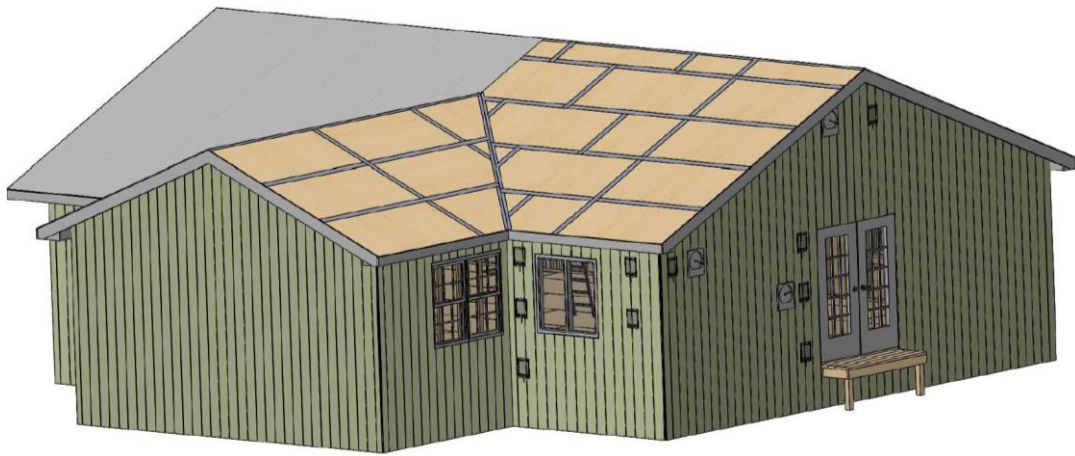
Conceptual drawing for full-scale test building, where half of the roof deck is covered with synthetic underlayment (system and component 1), and half of the roof deck has the seams taped at sheathing joints (system and component 3). Locations of doors, windows, and wind-driven rain gauges are shown for one reentrant corner and one gable end of main building. Main building is 9.14 m x 12.19 m, and smaller attachment is 3.05 m x 6.10 m.
